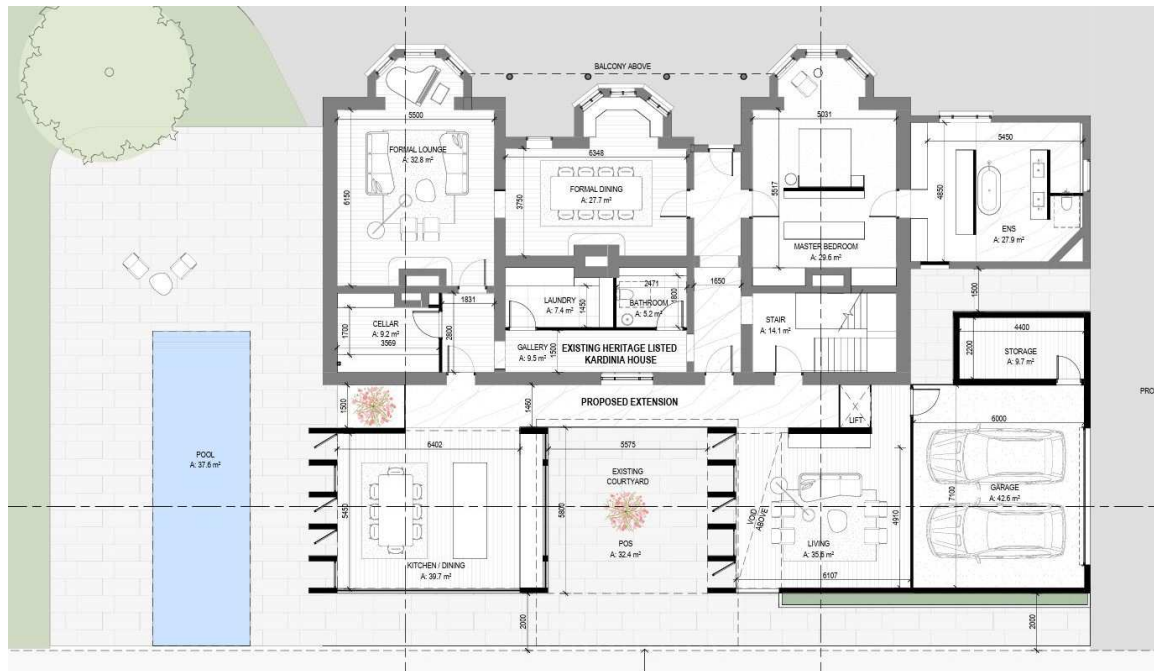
Proposed ground floor works to Kardinia House, with the new addition set off the back wall of the house connected by a breezeway-style linking element. Source: Plus Architecture.
